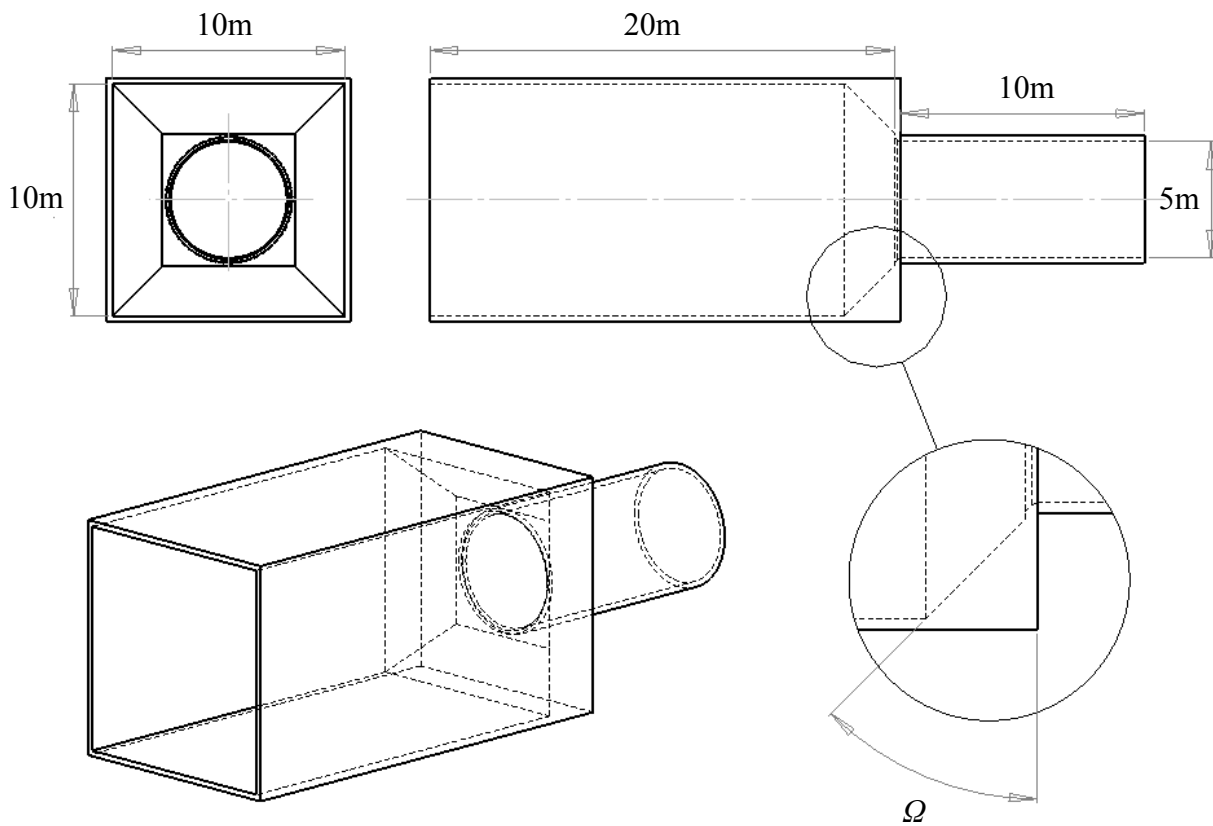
‘Square’ Ramp Design in the Downstream Corner of the Working Section
